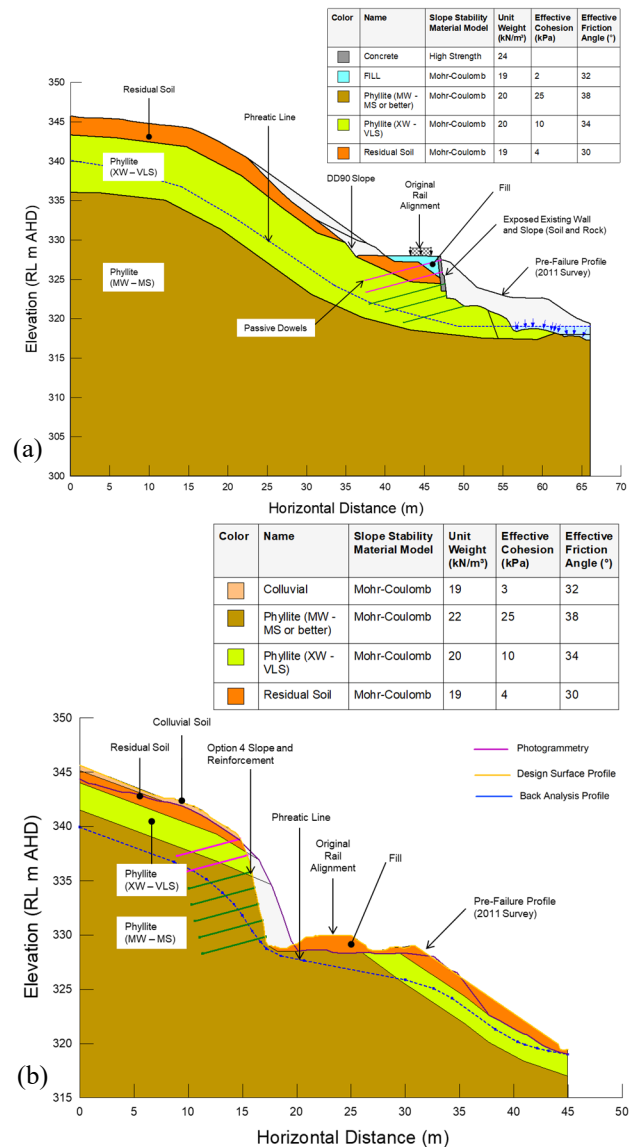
Geotechnical ground model adopted for remedial design of (a) downslope embankment and (b) upslope cutting.
